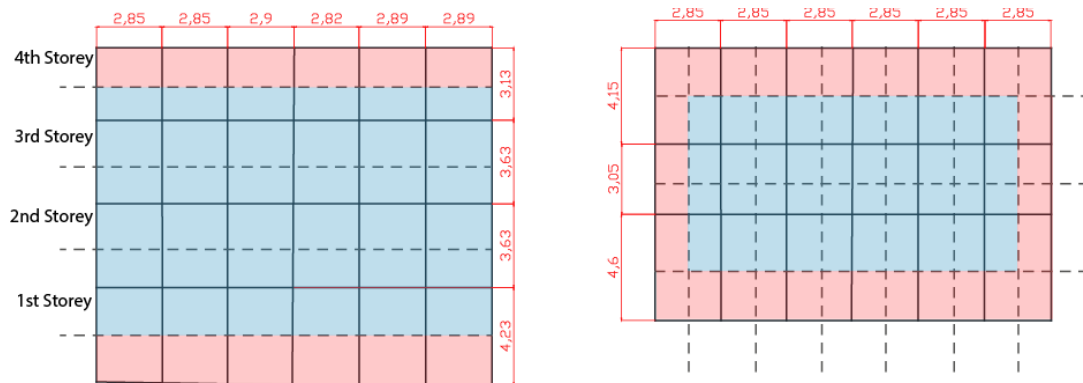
scheme of mass distribution: (right) elevation view. (left) floorplan view.
